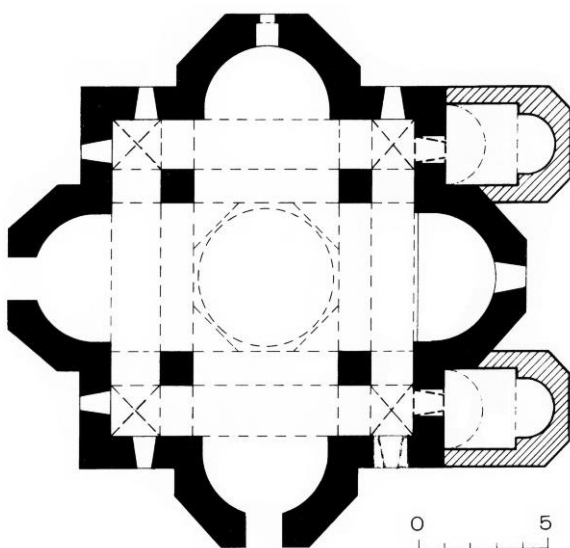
Bagaran, St John church, 624-631, plan © M. Asratjan 2000, p. 140
